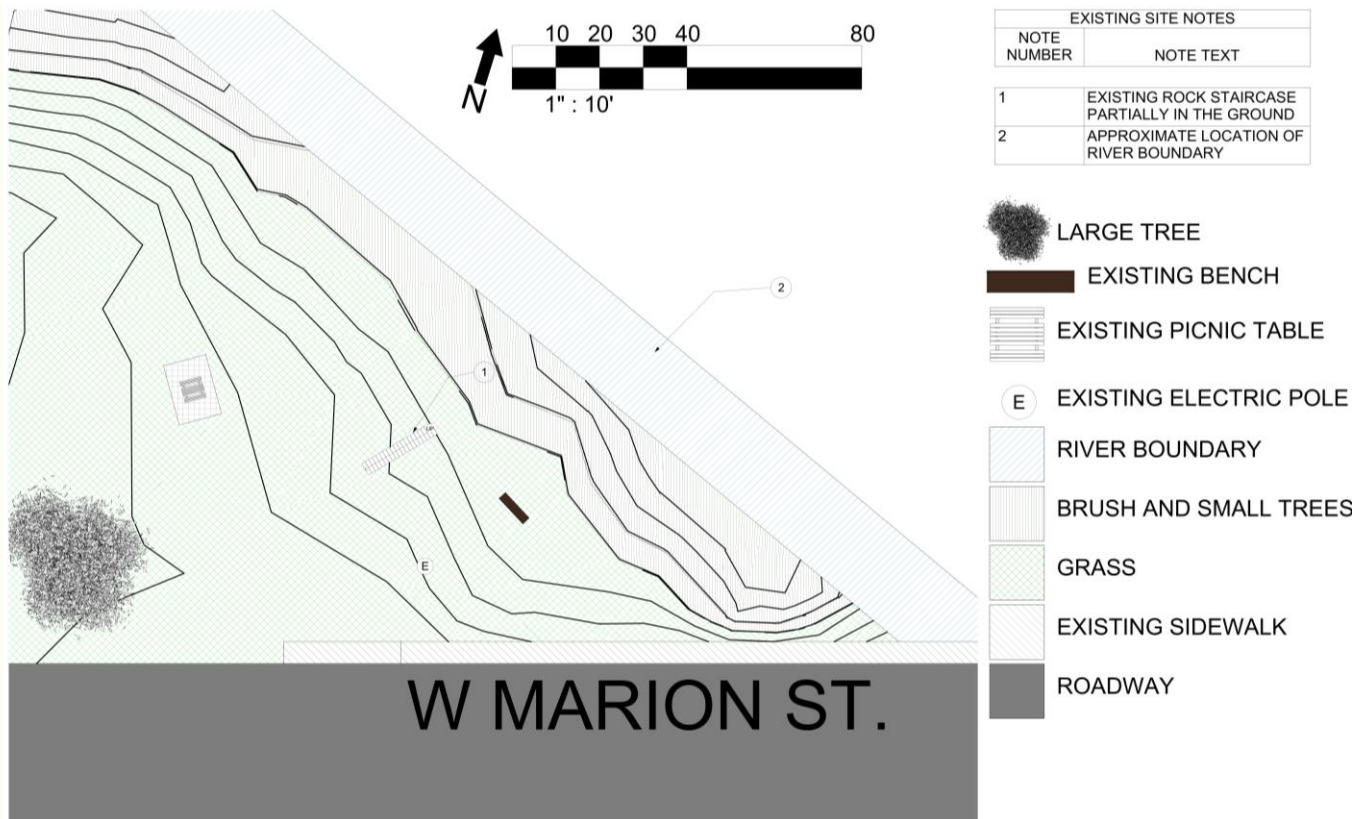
W Marion St. Site existing conditions, containing a bench and staircase that are in poor condition.
